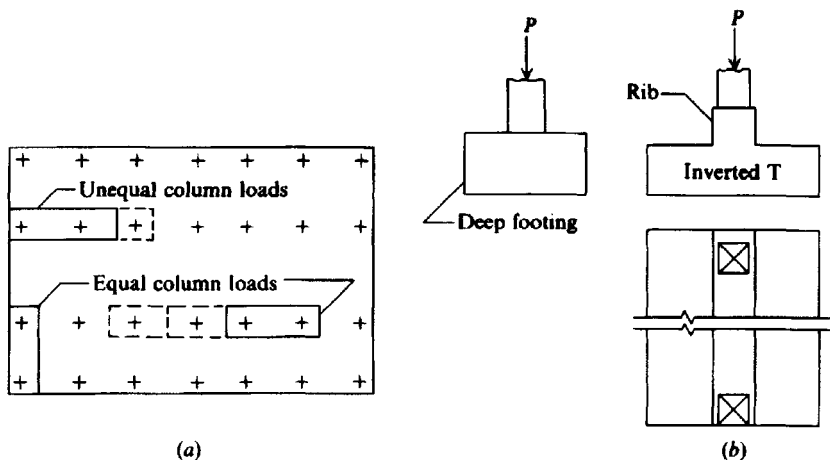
(a) Typical layout of combined footings for column loads as shown; more than two columns can be used. (b) Deep footings for heavy loads and the use of a rib or inverted T beam to reduce footing mass.
